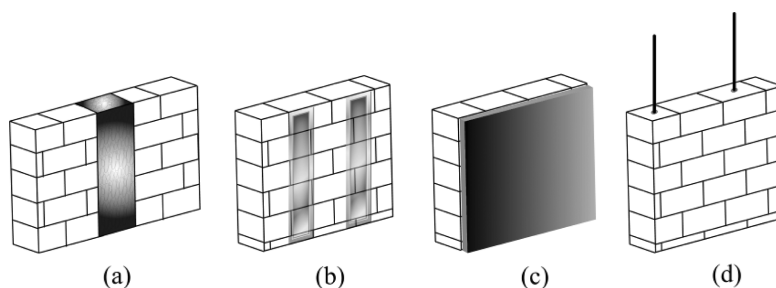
Masonry wall retrofitting techniques: (a) attachment of reinforcing members, (b) FRP surface overlays, (c) shotcrete and (d) reinforced core technique
